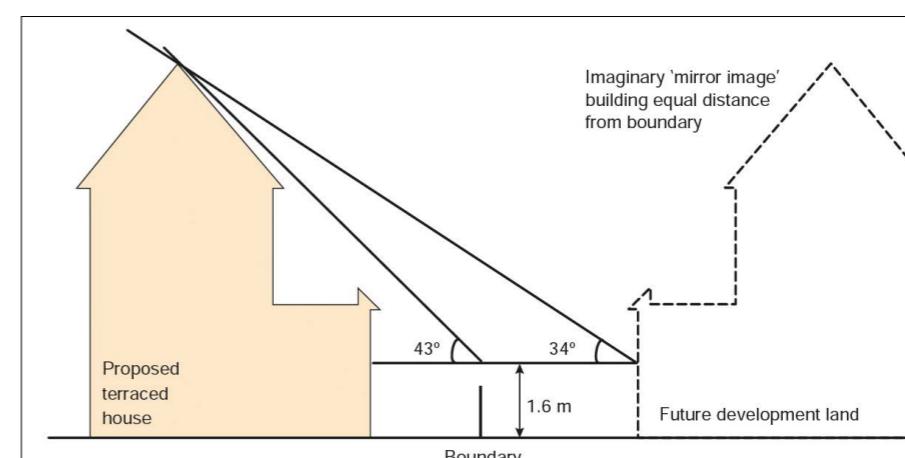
Problems with the boundary criterion can occur when a stepped façade overlooks adjoining land
